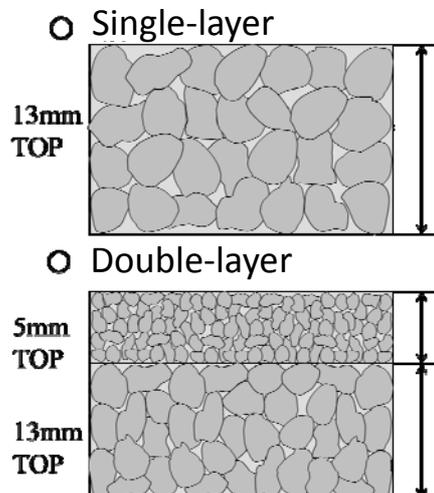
Structures of Single-Layer and Double-Layer drainage pavements
